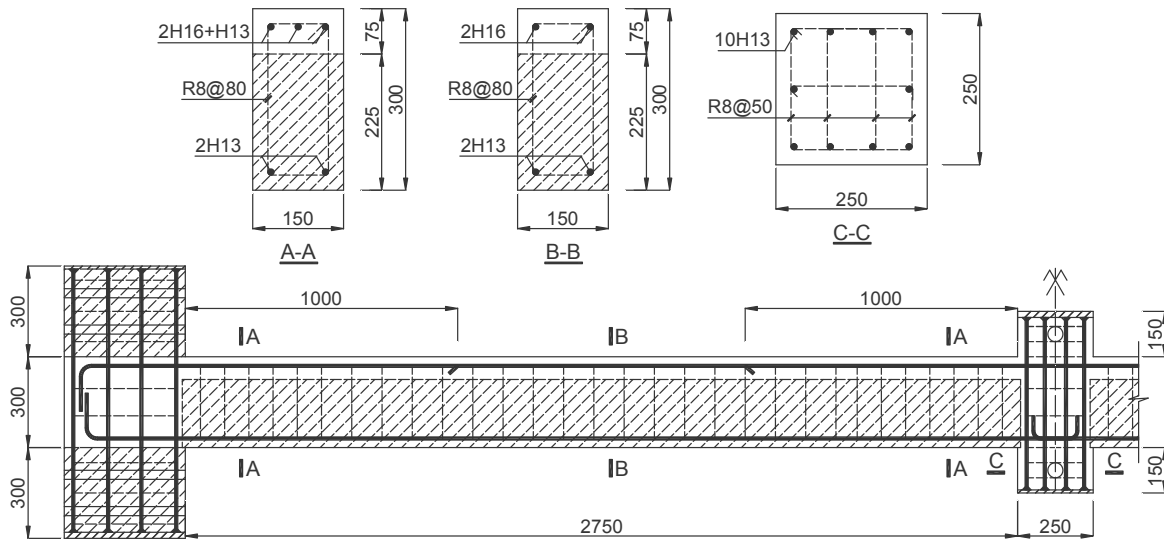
Geometry and reinforcement detailing of beam-column sub-assemblage CMJ-B-1.19/0.59
